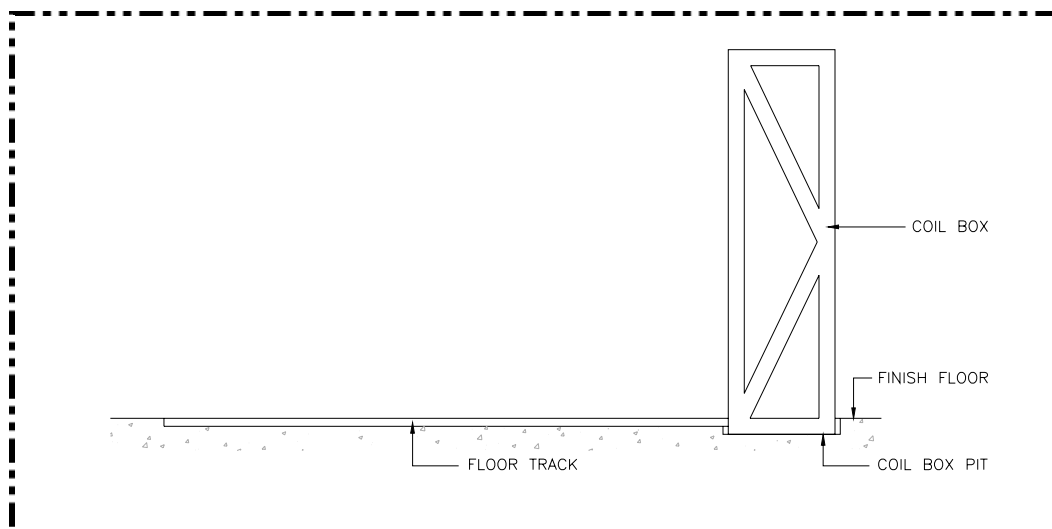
WITH A FLOOR TRACK ASSEMBLY
